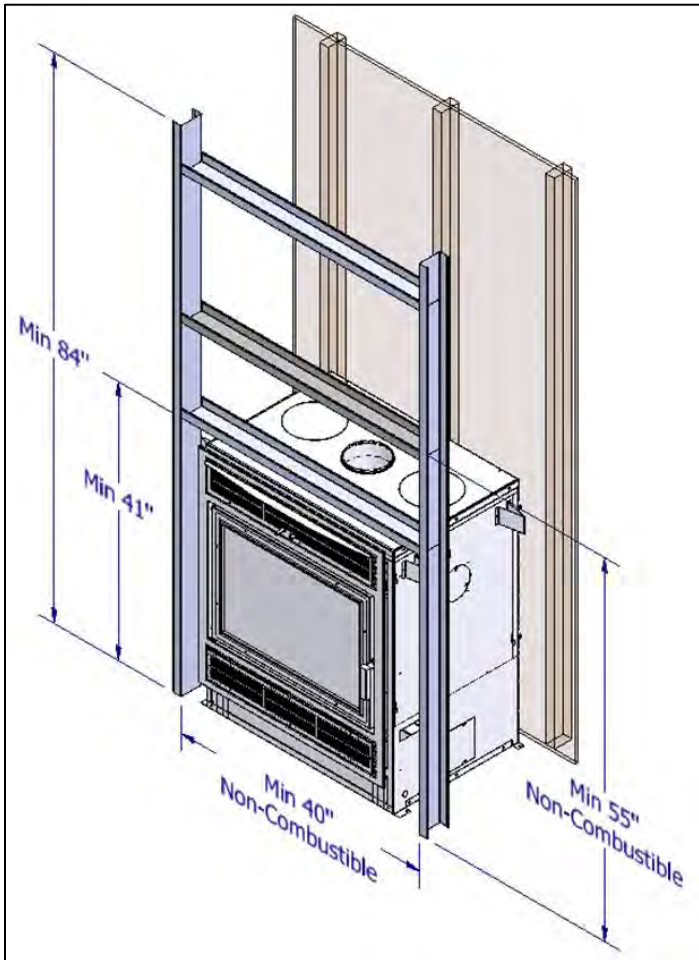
Minimum Elegance 42 Framing Dimensions
